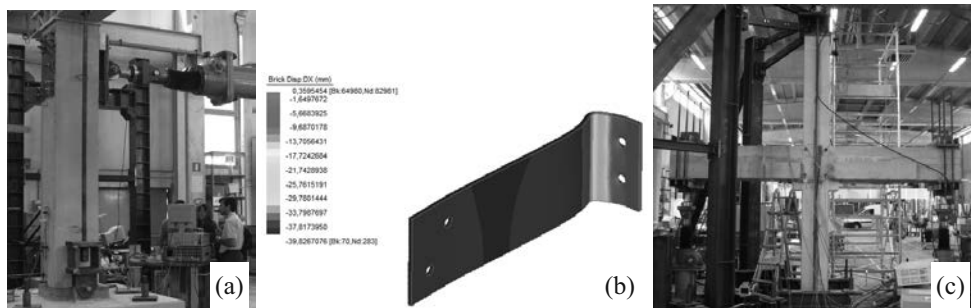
(a) column-foundation, (b) floor-beam and (c) beam-column connections.
